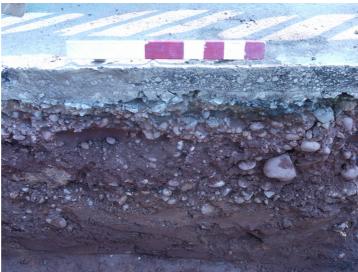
West facing section of southern extent of pipe trench showing subsoil (102), with 0.5m scale
